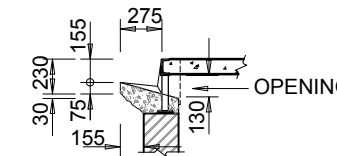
DETAILS OF STEEL PILLAR FOR USE ON PRECAST UNITS
